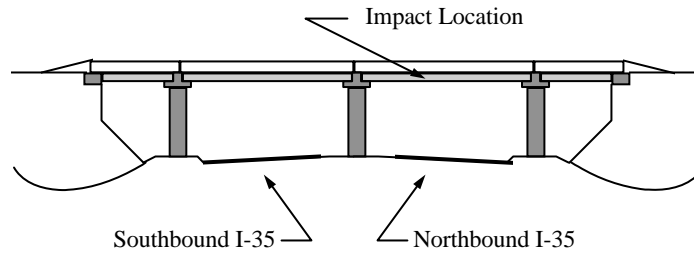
Evaluation of bridge structure at Jarrell, Texas
